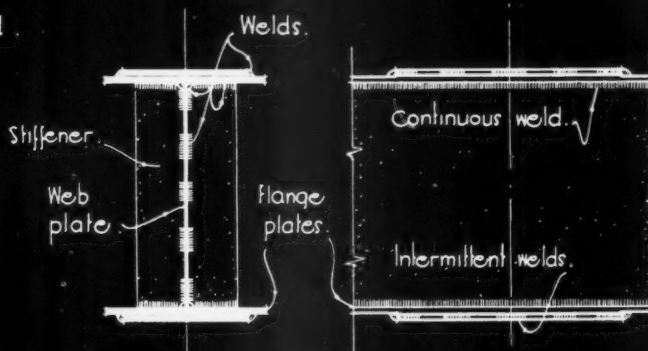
SECTION & ELEVATION SHOWING WELDING TO COMPOUND PLATE GIRDERS .
